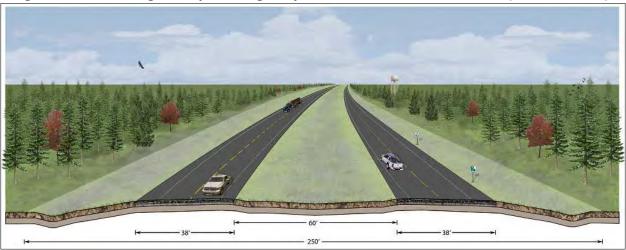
Rendering of Proposed Highway LA 3241 from I-12 to Bush, LA. (Fenstermaker)
